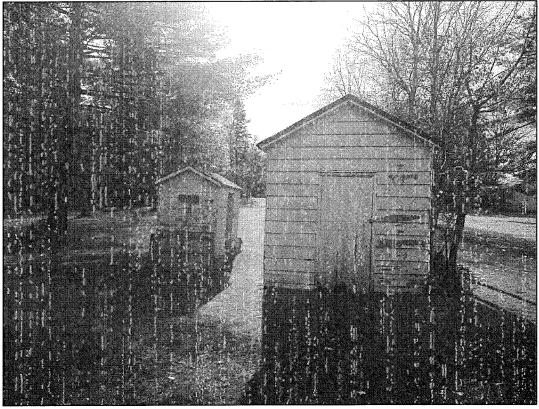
North Elevations of outhouse (right) and smokehouse (left)
